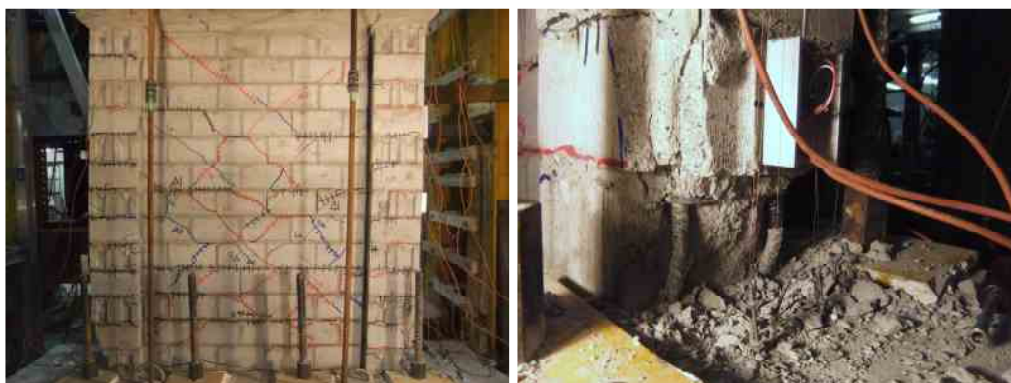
First Signs of Face Shell Spalling in Wall 4 ($\Delta\% = +3.16\%$)
